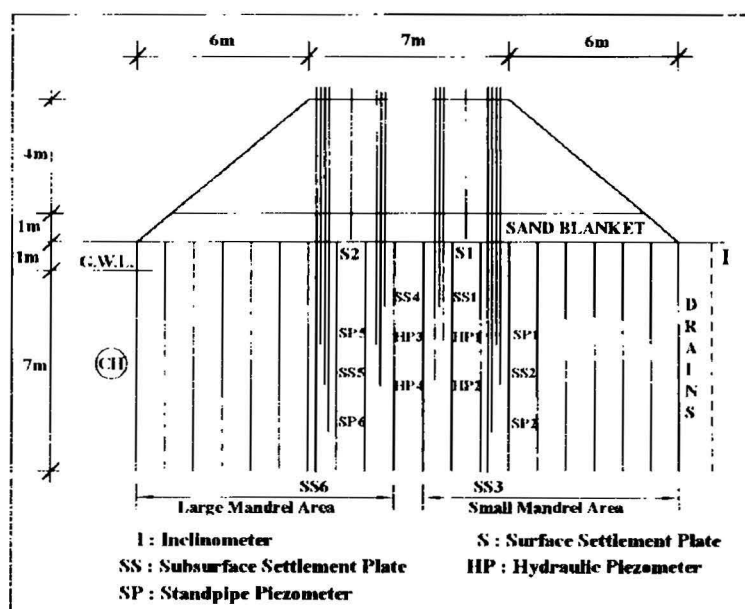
Line Sketch of Test Embankment with Instrumentation
